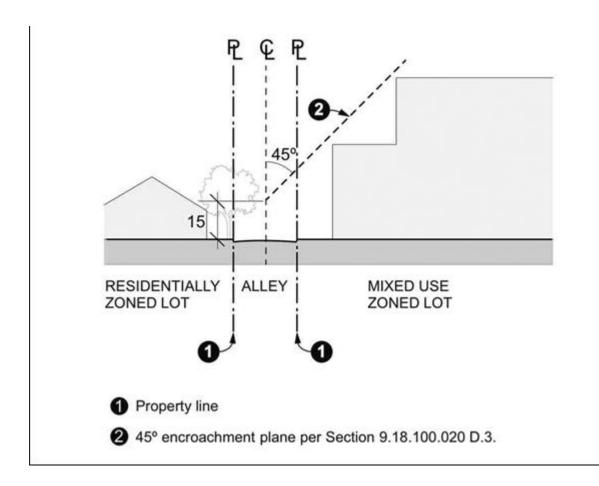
Rear Yard Setback and Encroachment Planeat Alley Abutting Residentially Zoned Lot
